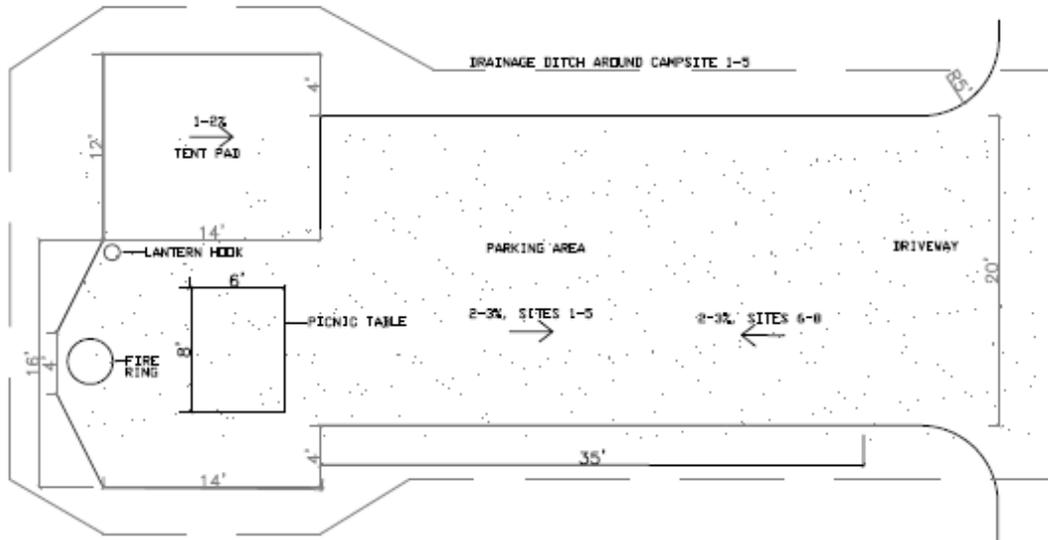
Grading Plan for sites 1, 2, 3, 5, 6, 7, 8, and the toilet building
